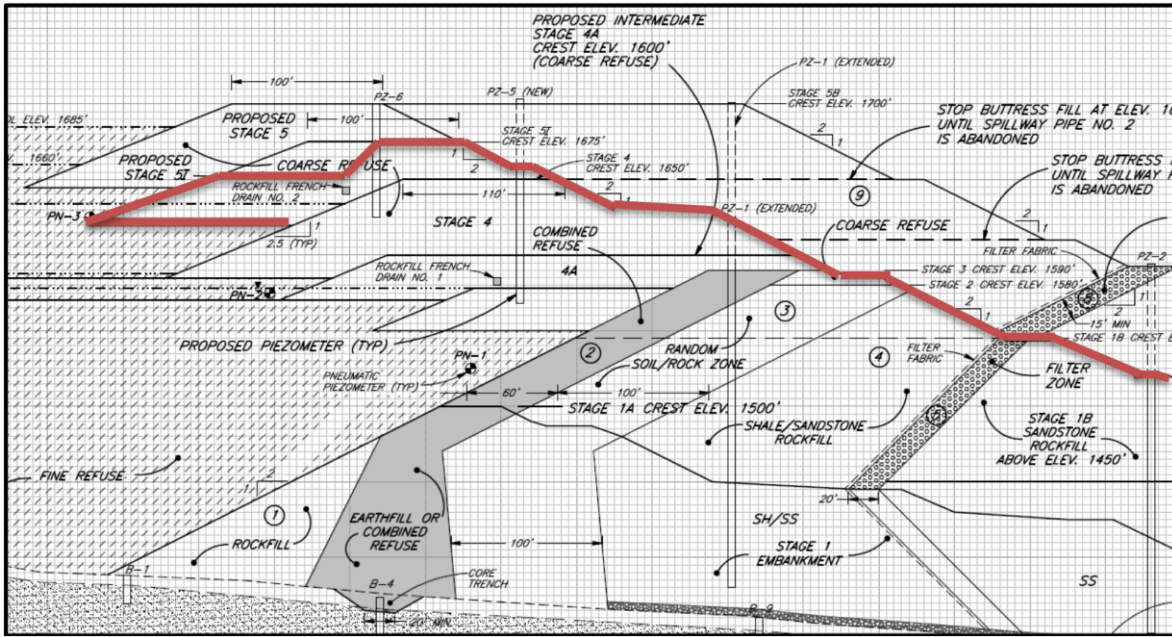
Cross-section of Dam Showing Pushout (Modified from GeoEnvironmental Permit Drawing, 2009)
